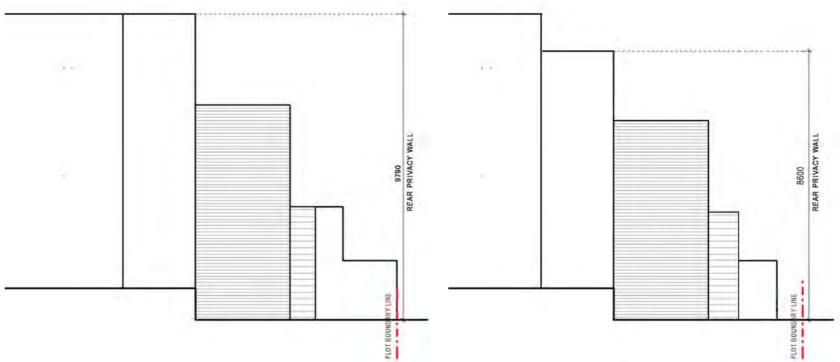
Right Elevation (Canal side) showing boundary wall for Villa 3.3 / Sabaah Applicable for Outer Canal Villas (*Note: Rear Privacy Wall length will vary as per plot size)
